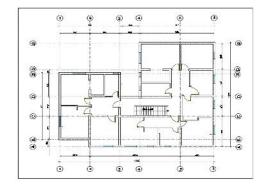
Typical floor plan Tab.1  $f_k$  - Masonry compressive strength [5]
